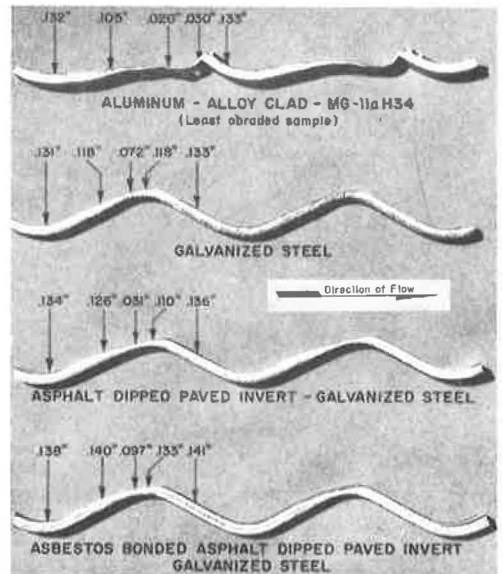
Results of abrasion tests, IV-SC1-5-C, Sta. 250+25, Bridge No. 37-165. Typical cross-sections of pipe invert after test exposure. (Note: All C.M.P. samples were 10 gage (0.140±). Steel samples are typical of the most abraded pipe sections.)
